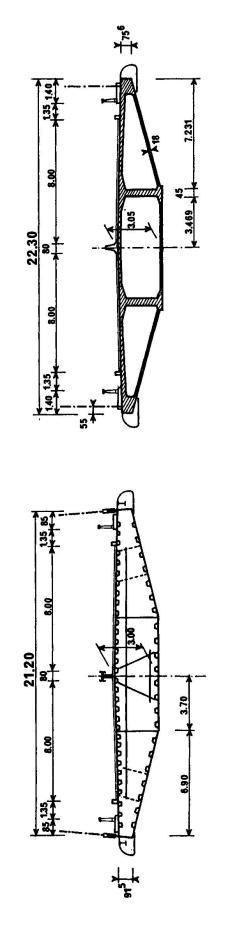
Typical cross-section for the steel part of the bridge (left). The cables are directly anchored through open sockets on the lateral webs of the box-girder. Typical cross-section for the concrete part of the bridge (right).
